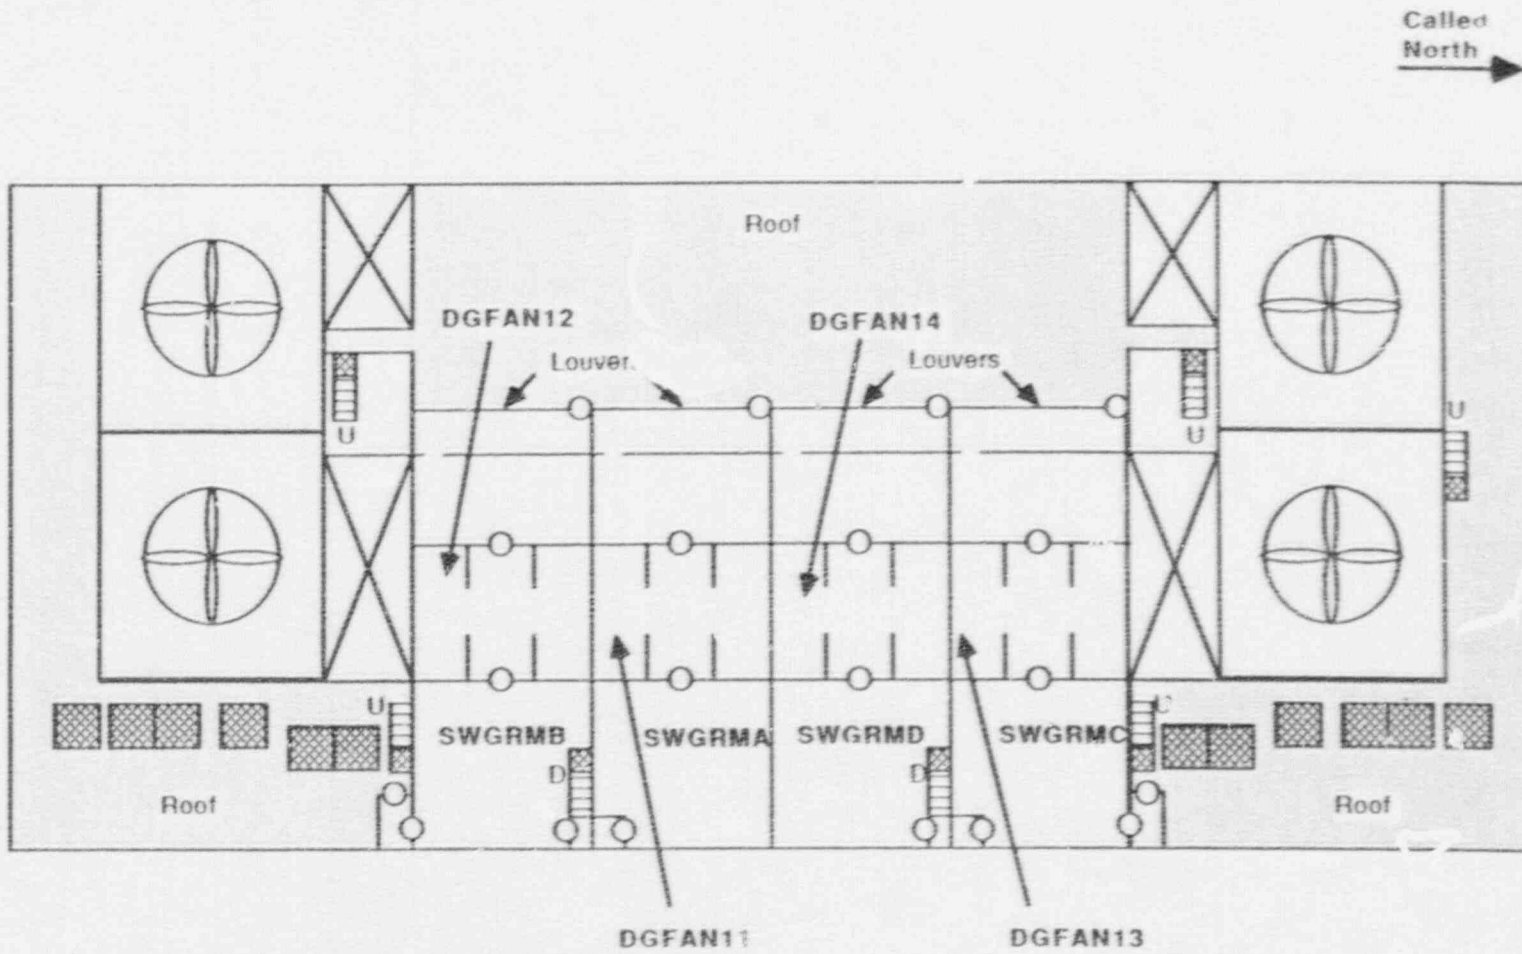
Enrico Fermi Unit 2 - RHR Complex Arrangement - Upper Elevation
